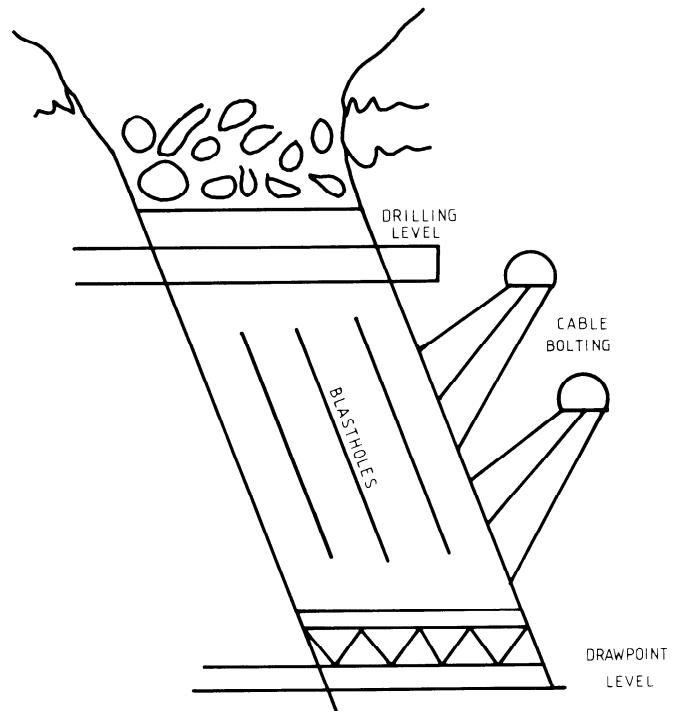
Cross section through a medium-sized underground mine.
